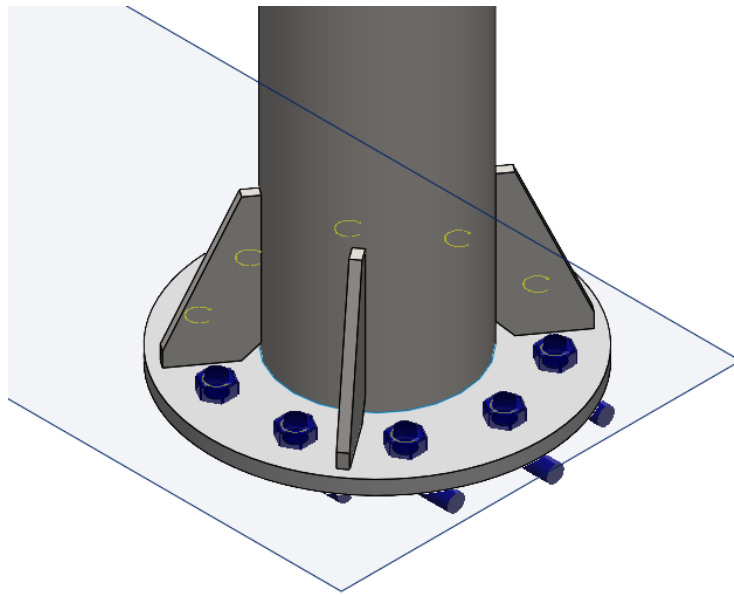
Foundation bolt -fixtures applied to attaching plate.
